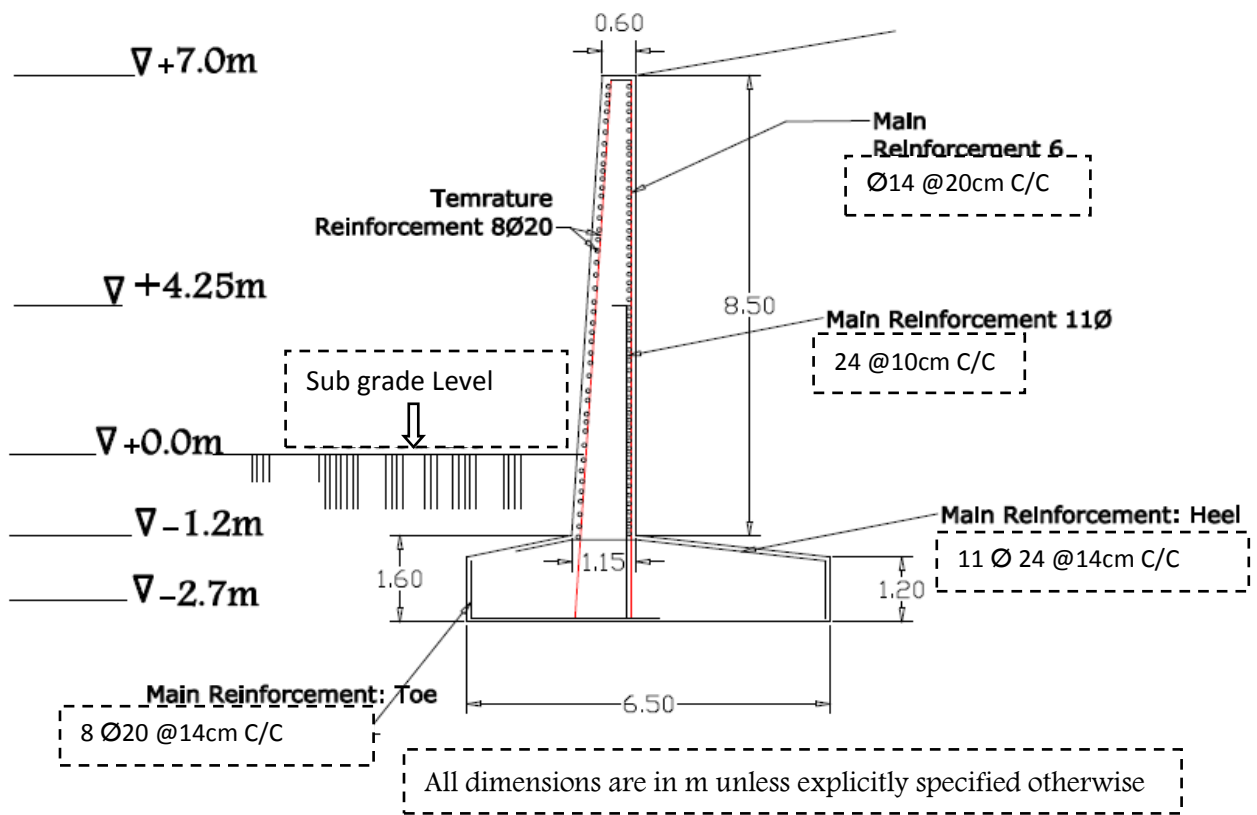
Typical structural drawing of cantilever retaining wall at Sta.68+080RHS
